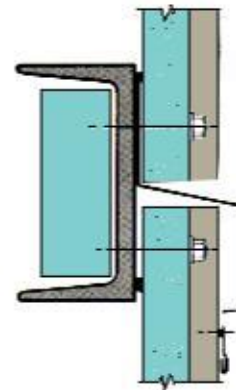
HORIZONTAL JOINT - Vertically laid panels
